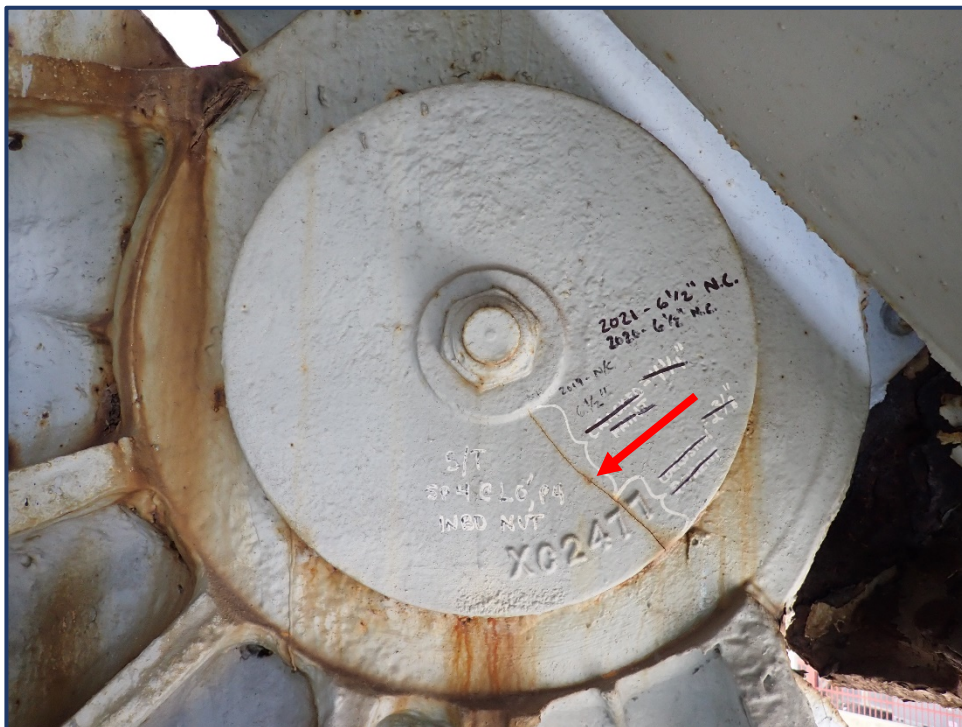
Span 4, South Truss, L0' Bearing, Crack in North Pin Cover Plate
